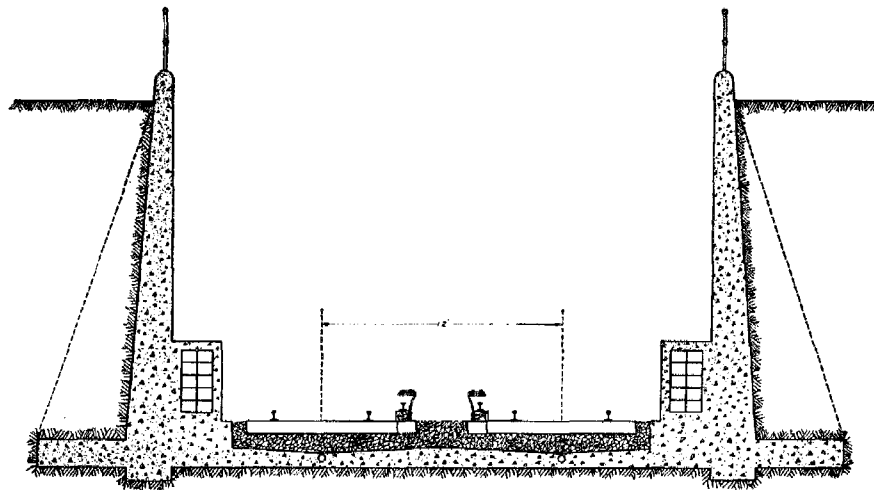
Open cut—Depressed tracks—Typical cross-section.
